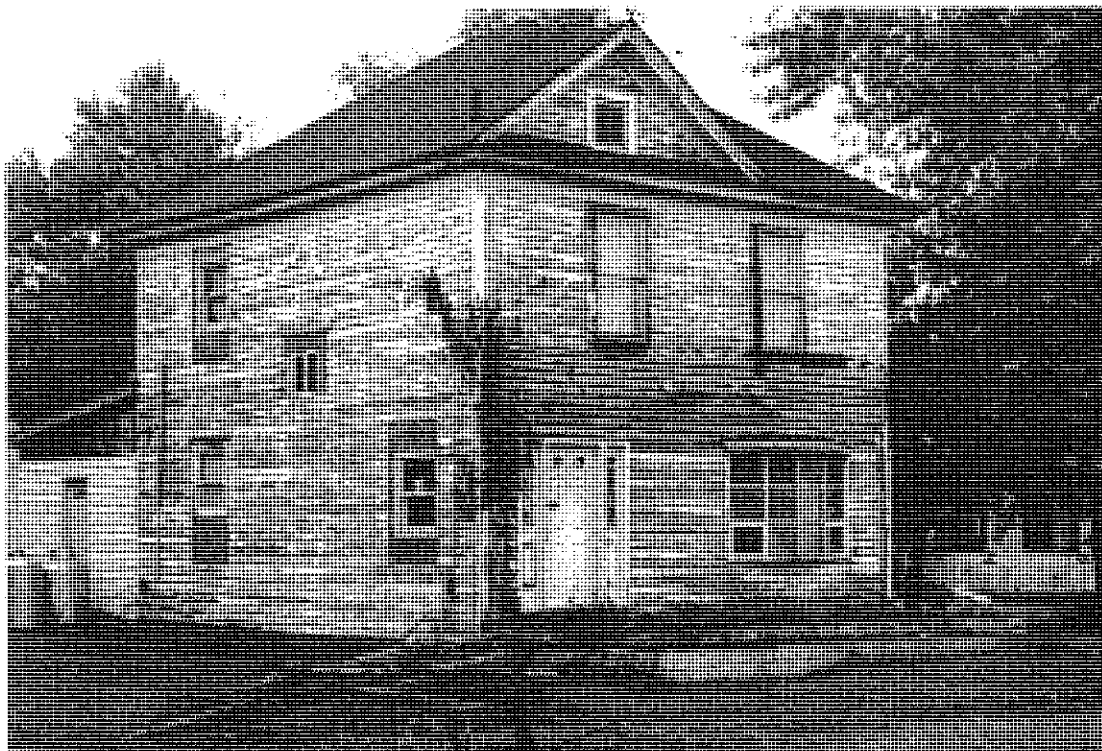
The inappropriate alteration of windows and doors, the removal of the front porch, and the lack of maintenance at this building could have been avoided through a design review process.
